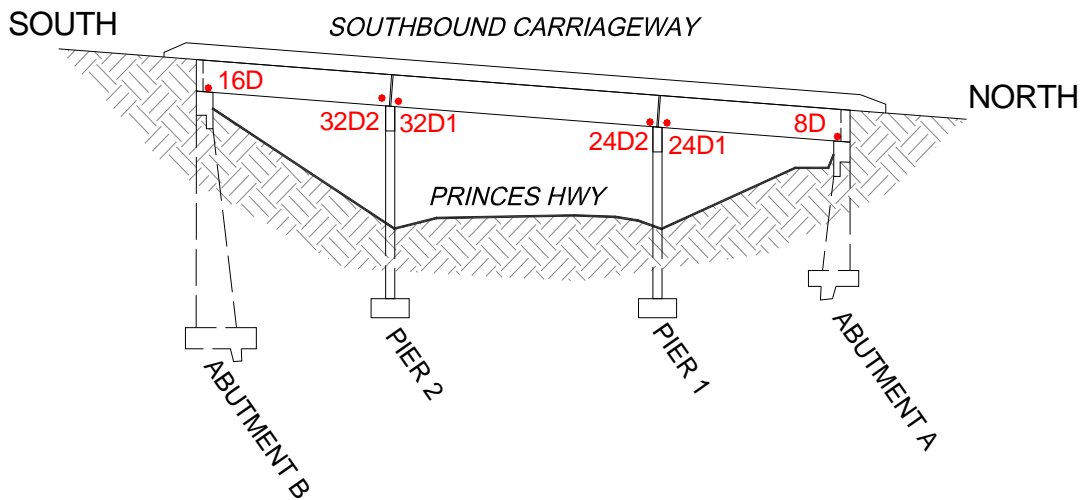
Bridge 2 - Deck Girders – Elevation 4 – Relative 3D Monitoring Locations
